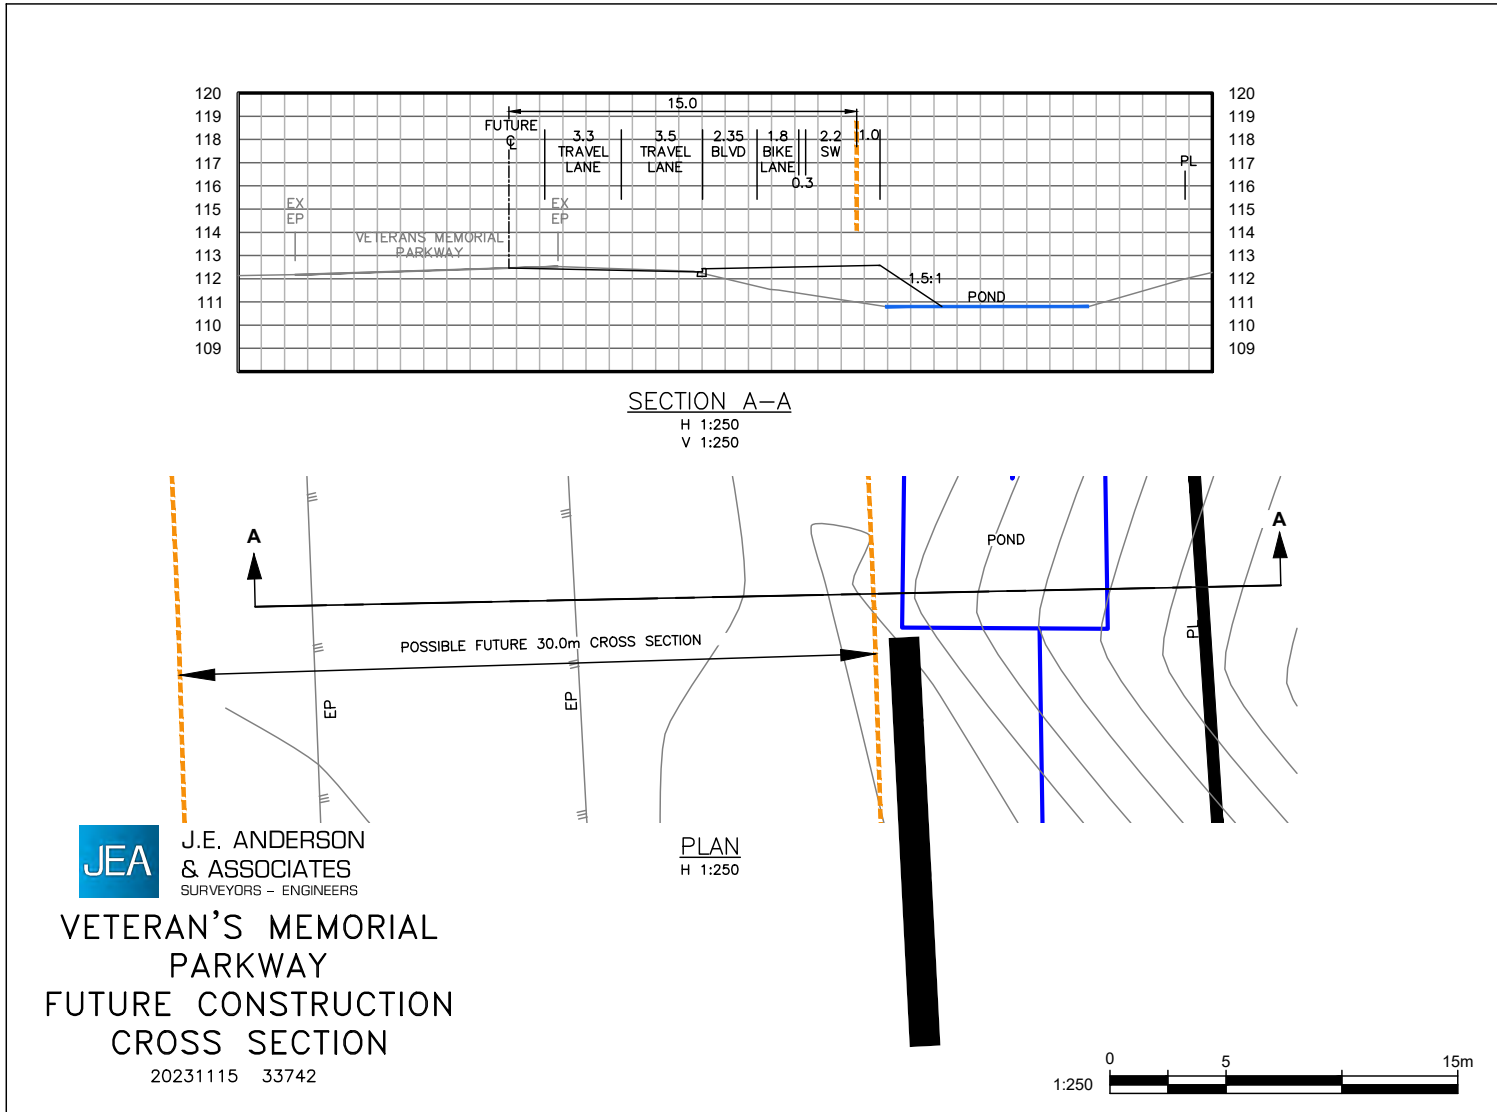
Cross section of proposed widened VMP roadway, relative to the stormwater treatment pond and subject property boundary (PL).
